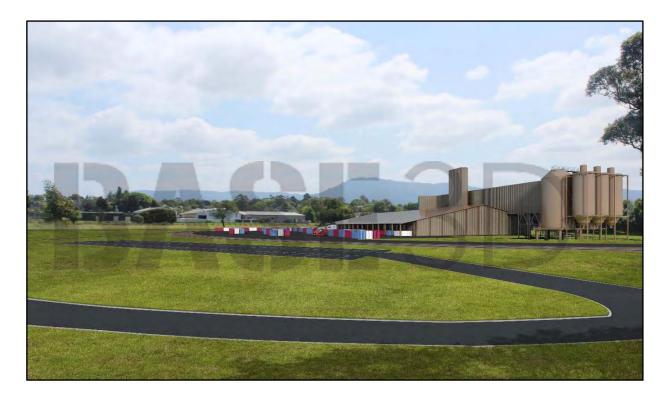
Photomontage of proposed Modified Packing Plant as seen from Bolong Road.
